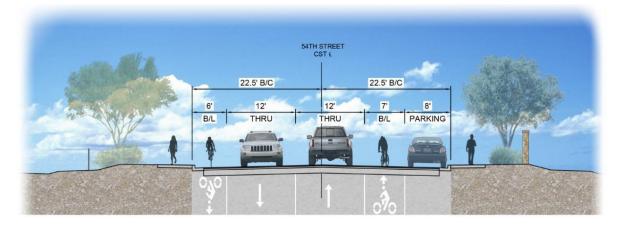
54th Street Typical Section - Segment H4 Standard Bike Lanes/Parking East Side
